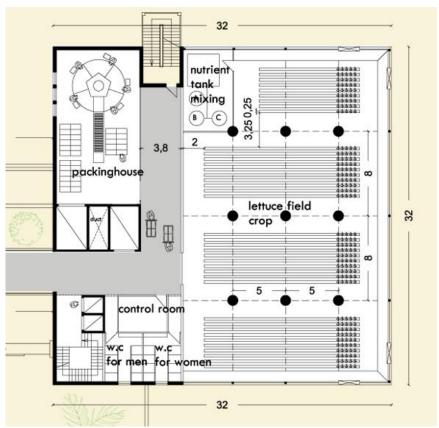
Typical floor plan showing chicory, lettuce, and spinach field arrangement
